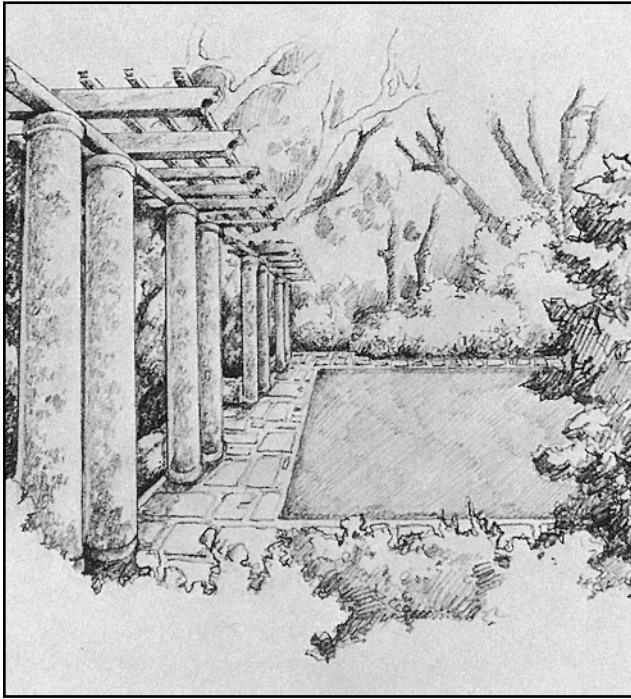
Perspective of the trellis structure. This drawing of the end of the pool area shows the construction intent for the trellis. Mounting locations for fixtures can be identified with a drawing like this. *Landscape Design and Drawing: Magrane Latker Landscape Design.
